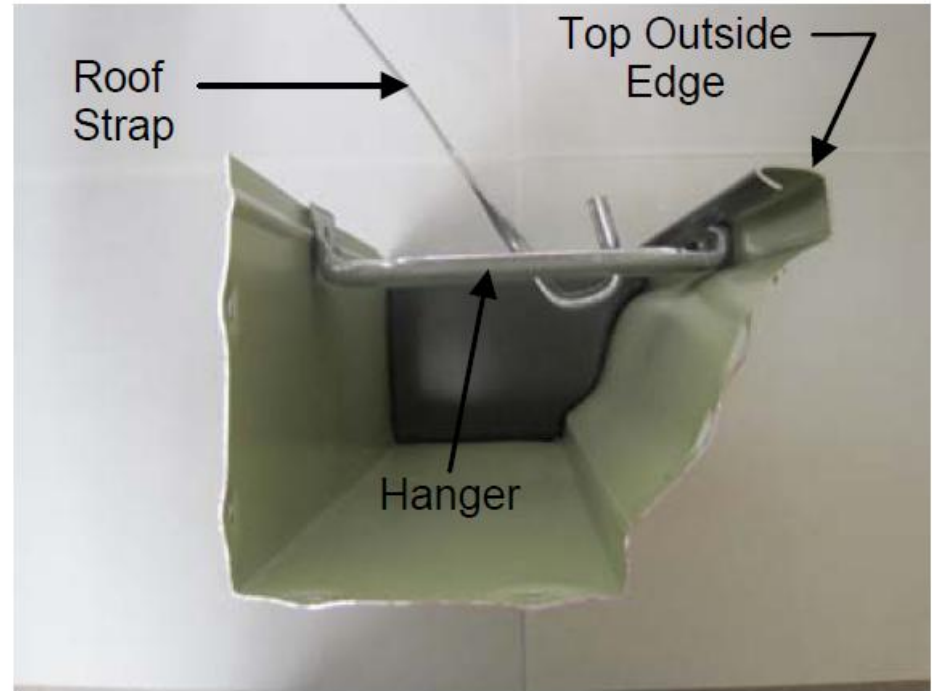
Typical Gutter Hanger and Roof Strap Attachment
